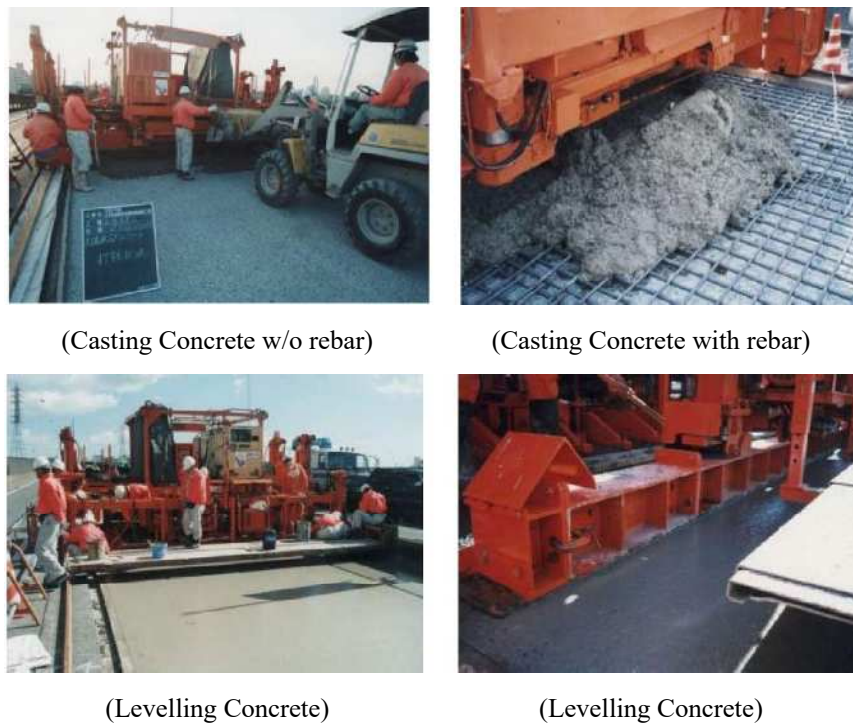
Example of Construction of RCC Deck Slab Thickening Method
